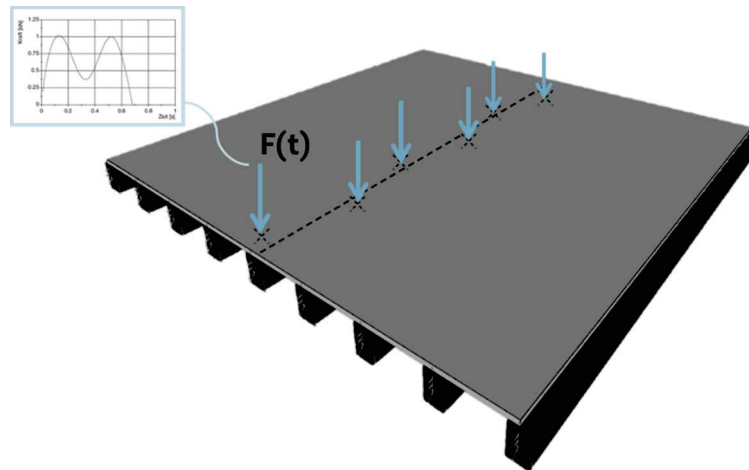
Positioning of steps forces on a FE model of a floor.
